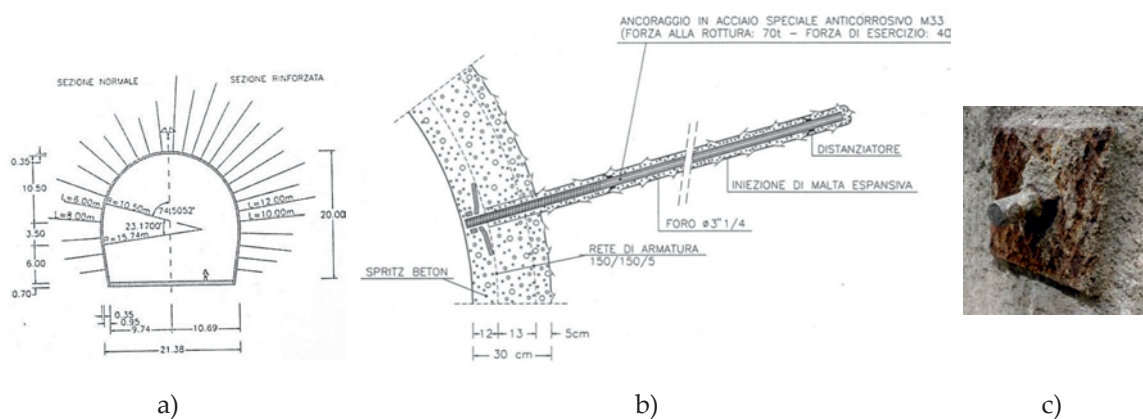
Consolidation interventions in the galleries: a) gallery cross-section reinforced with rock bolts [1]; b) rock bolt details and spritz-beton coating [1]; c) actual condition of a rock bolt head (picture taken in an accessible point of galleries).
